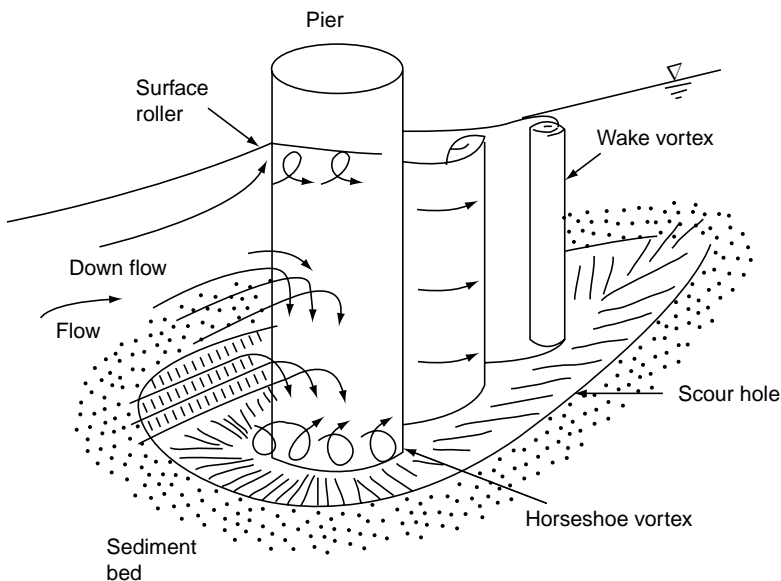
Schematic sketch of vortex system at circular bridge pier
